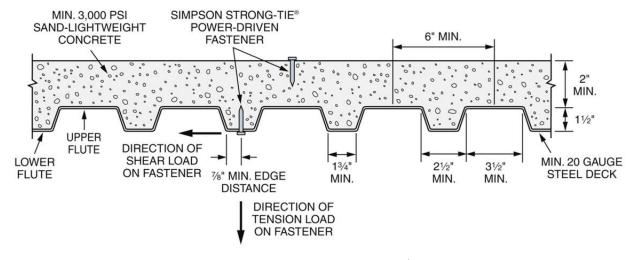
INSTALLATION IN 2-INCH CONCRETE FILL OVER 11/2-INCH-DEEP STEEL DECK
